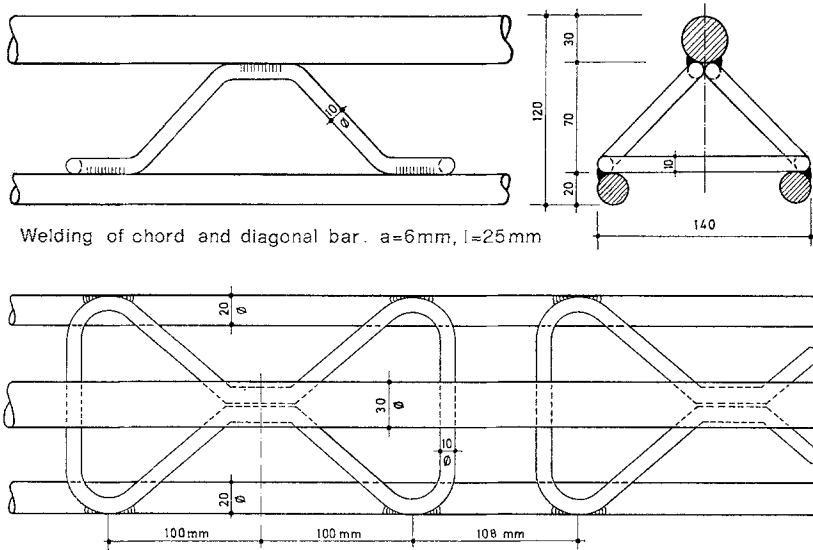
Typical details of a girder with 3 chords (System Pantex)
